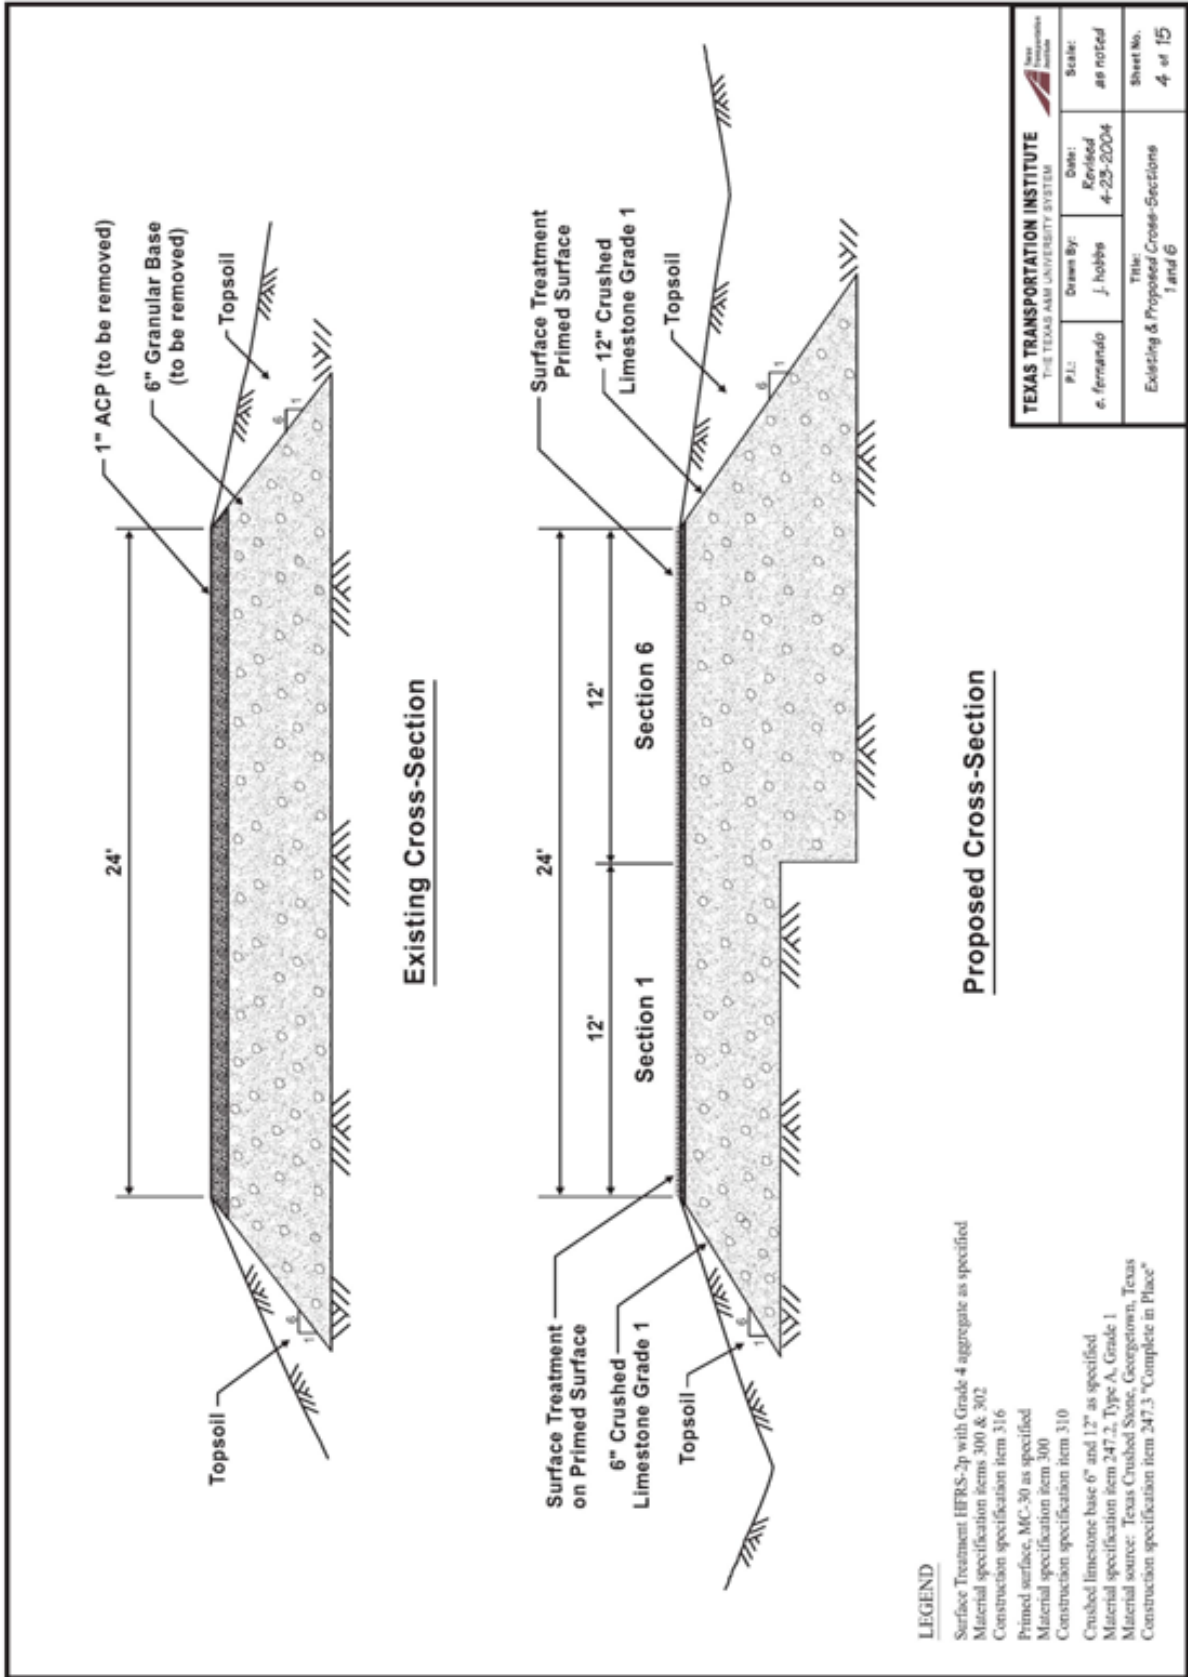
Existing and Proposed Cross-Sections for Sections 1 and 6.
